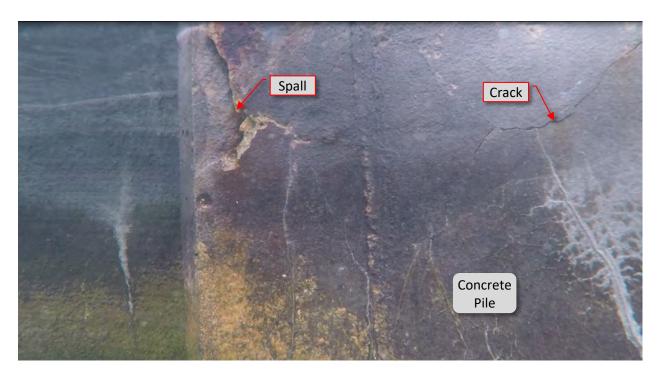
P15. STA 3+48. Cracks at south face and spall at west flange at pile.
